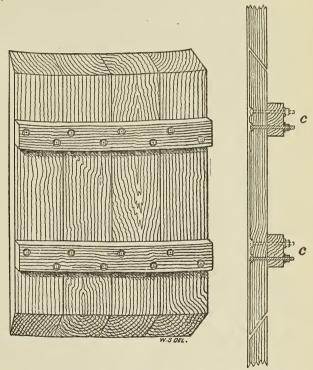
Door of stave silo. The cleats c c are on outside of door.
